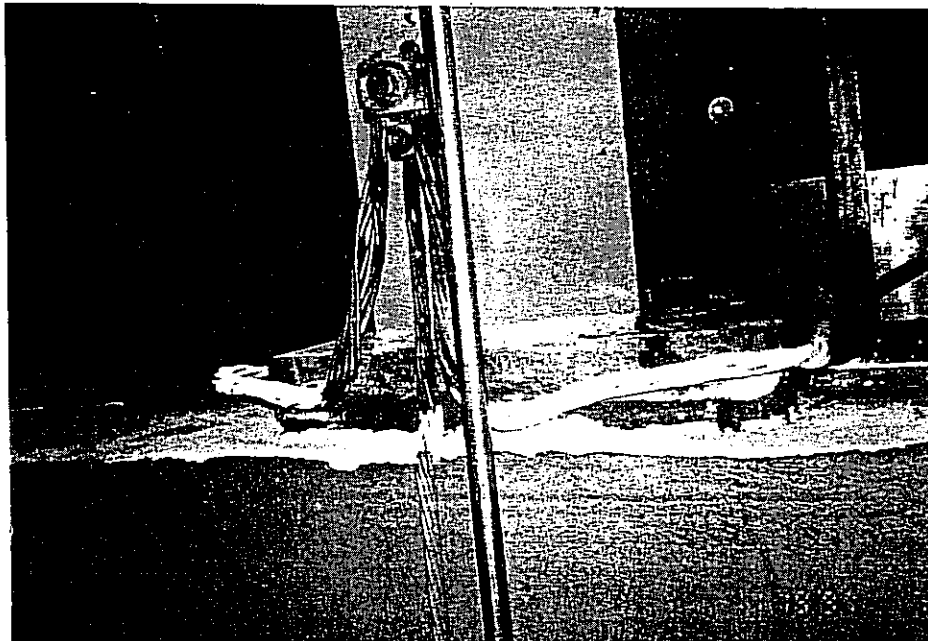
Typical column base anchorage to grade beam as seen on the ground floor mechanical room. Notice the connection and bolt installation are not designed as a moment connection.
